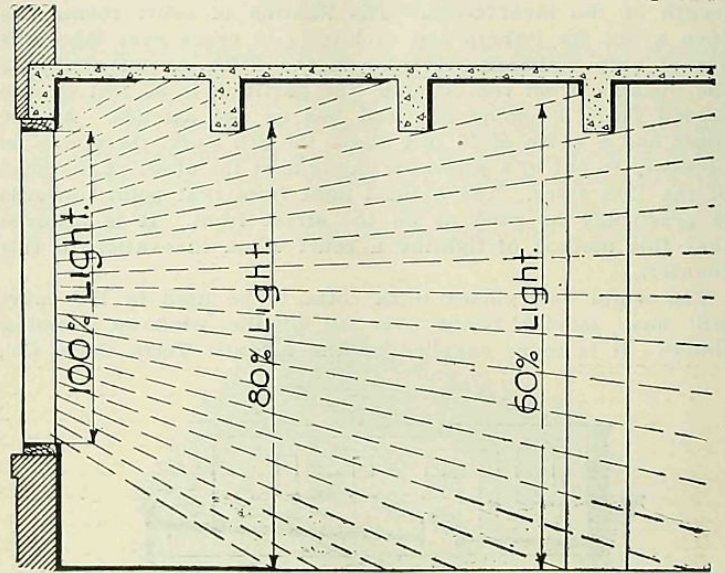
REINFORCED CONCRETE BEAM AND GIRDER SYSTEM. BEAMS AND GIRDERS BLOCK LIGHT RAYS.
